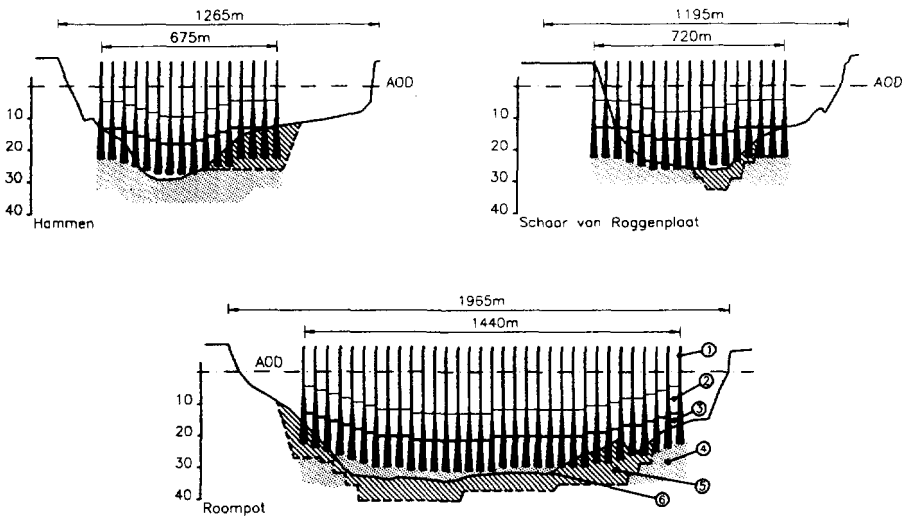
Cross-sections of the three tidal channels with the SSBES: (1) piers, (2) sill beam, (3) underwater sill, (4) depth compaction, (5) seabed improvement, (6) original bed profile.
